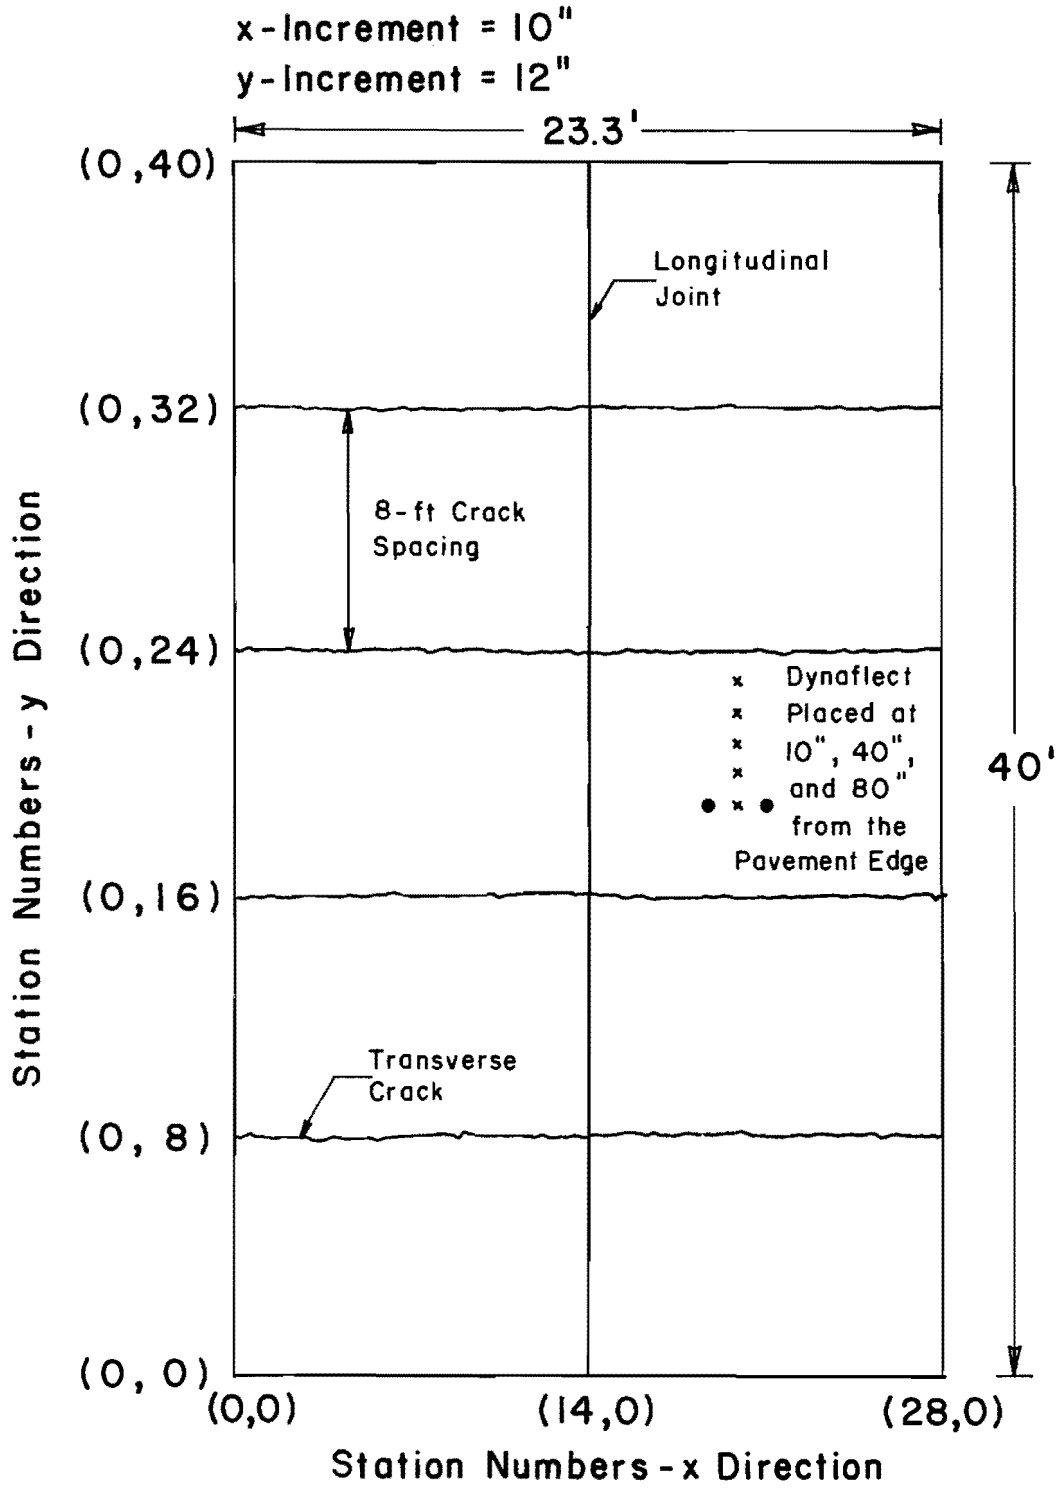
The slab layout with the load, transverse cracks and longitudinal joint used in the computational experiment.
